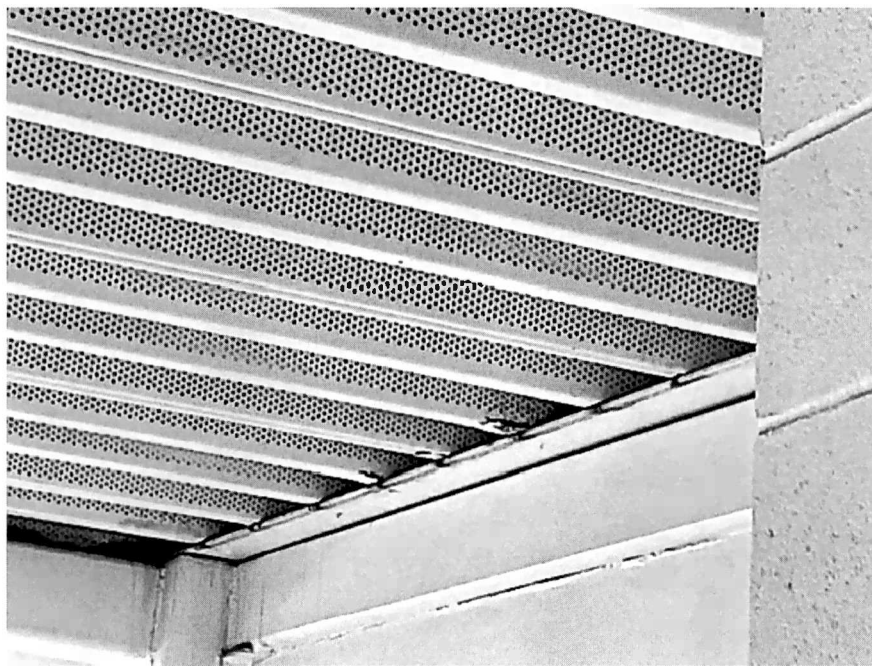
Severely damaged roof deck bearing at west wall
